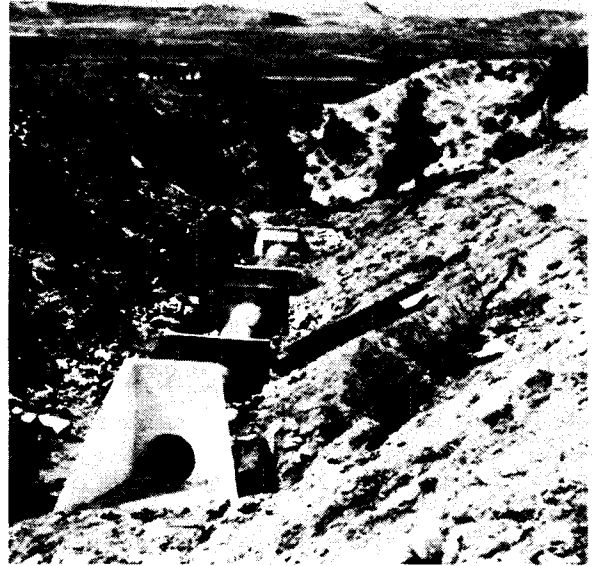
Culvert, constructed prior to construction of canal. P514-417-366
